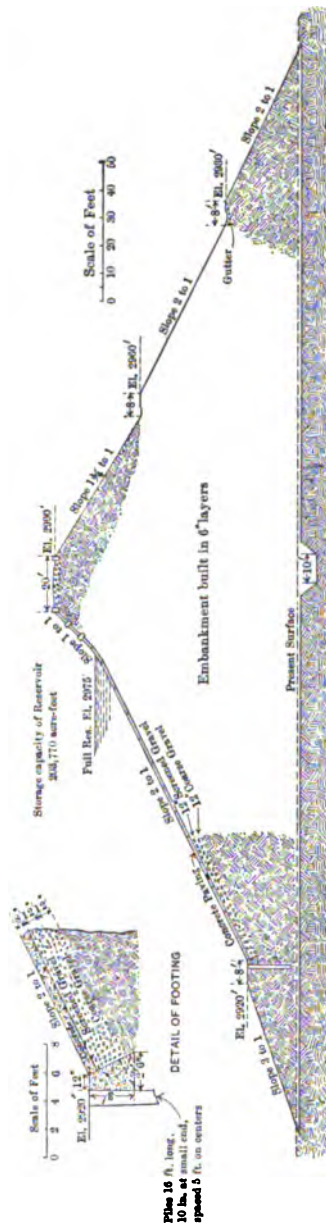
Section and Paving; Belle Fourche Dam, South Dakota.
